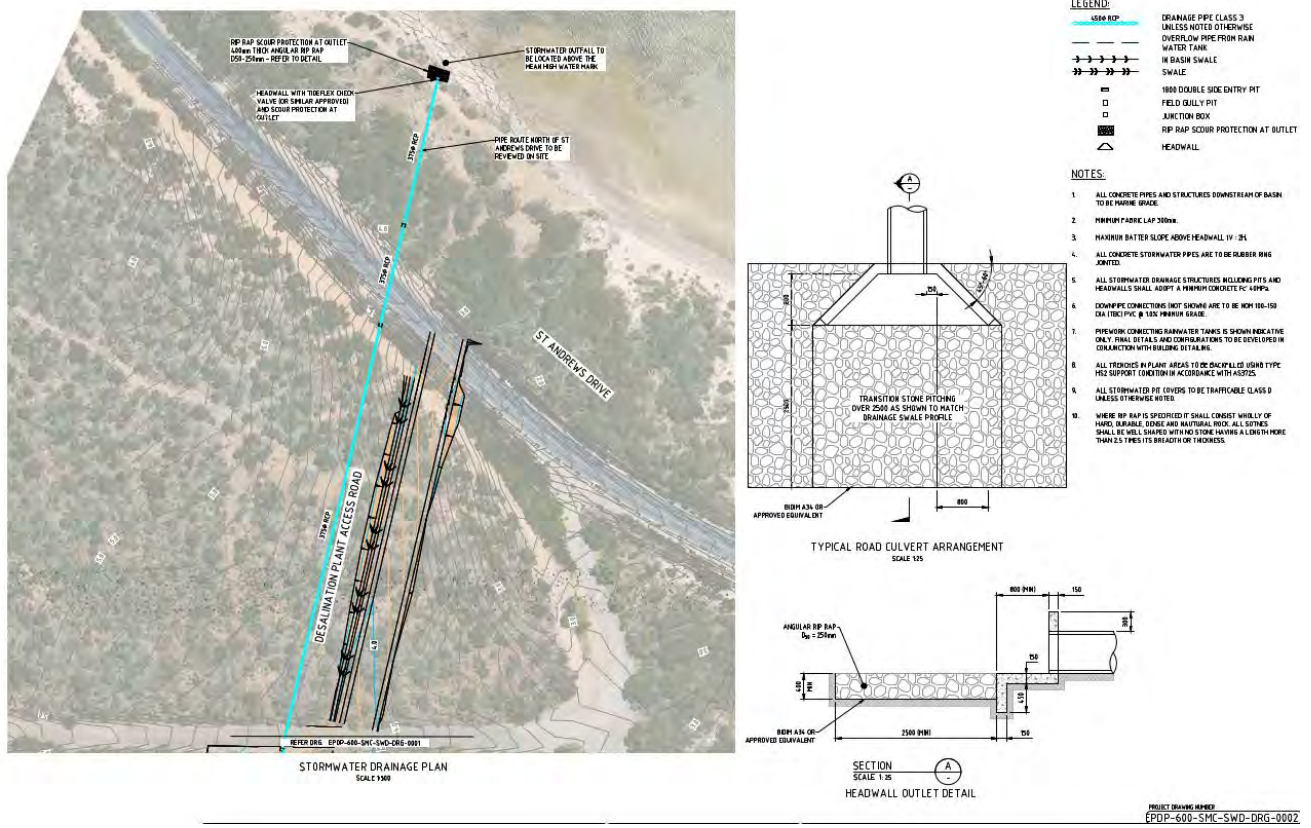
Stormwater management plan sheet 2 Concept design (EDPD-600-SMC-SWD-DRG-0002)
